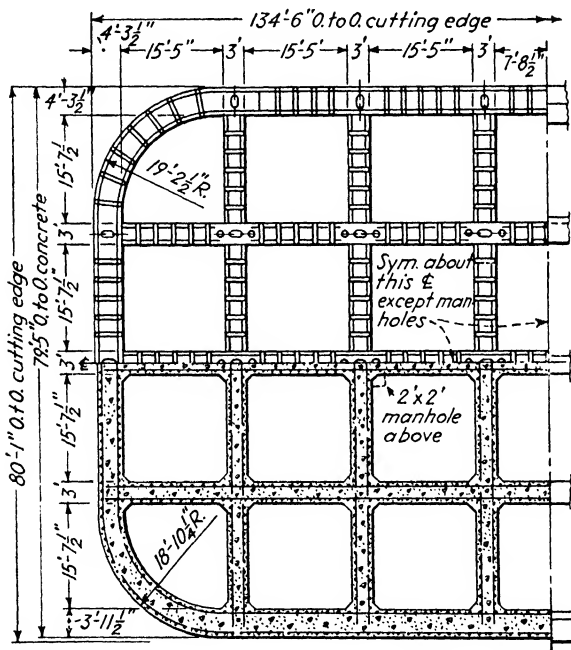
Caisson for Pier 3 of the East Bay of the San Francisco-Oakland Bridge.
